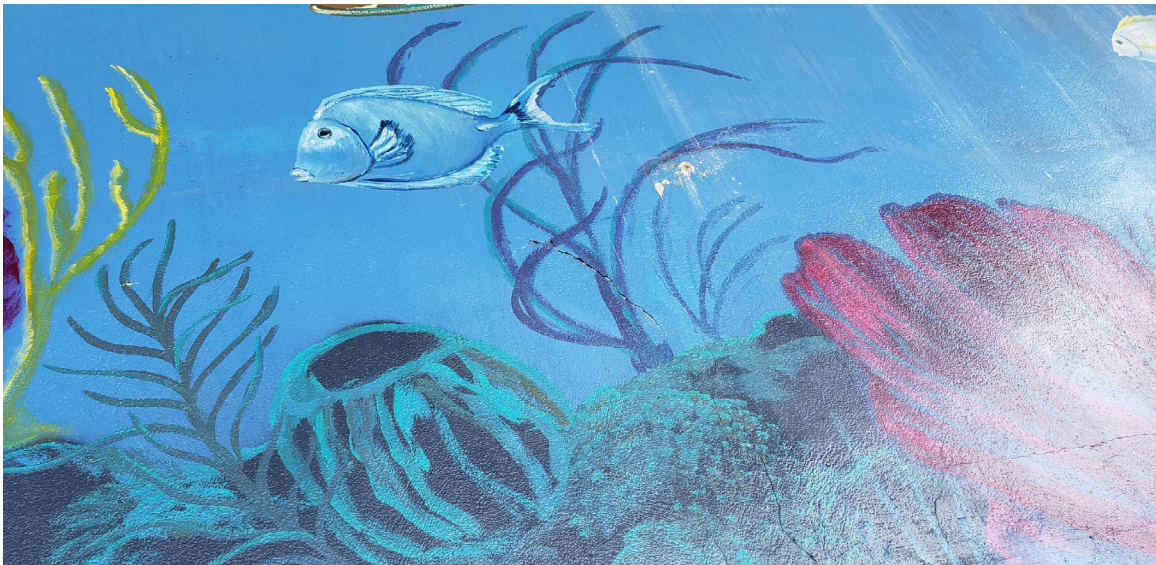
Location 13: Cracking in the wall and some spalling of concrete observed.
